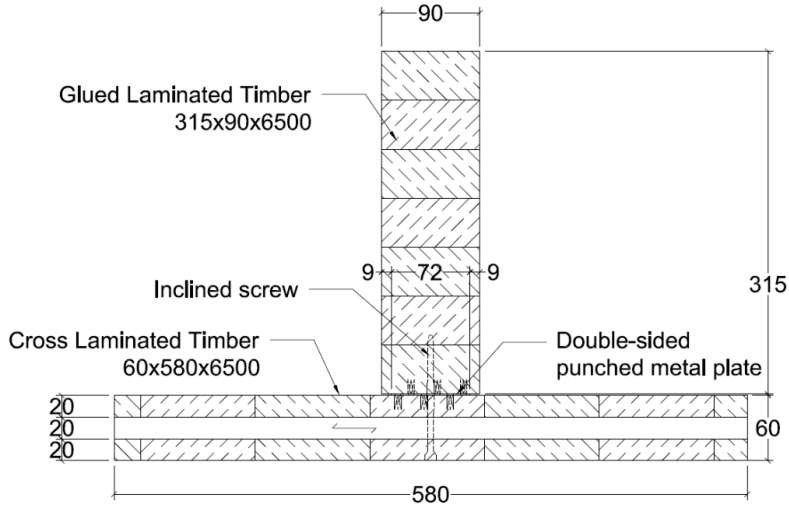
Cross-section of the composite Glulam-CLT beam with double-sided nail plate and screw shear connection (dimensions in mm).
